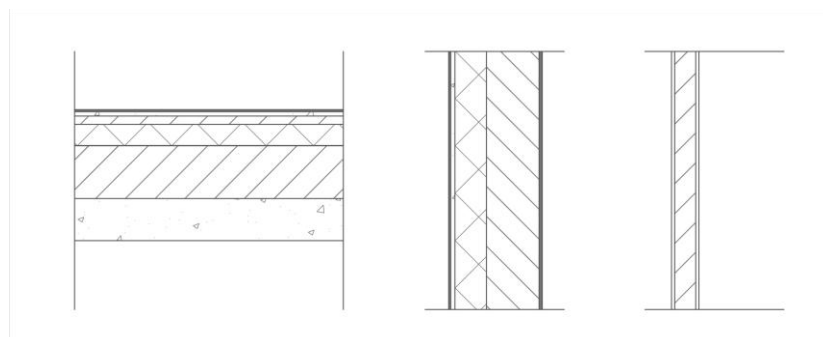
Constructive structures. Floor to ground. External wall. Partition wall
